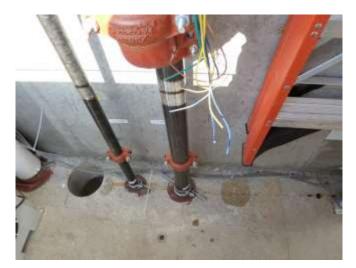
Clamps on bottom of Floor 4 drain pipe and riser
